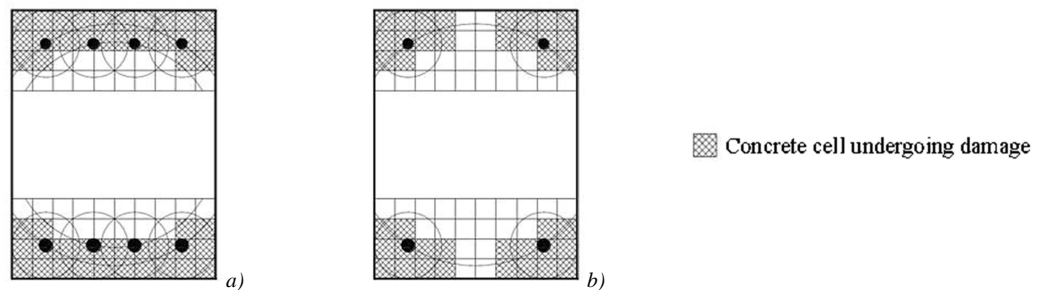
Concrete elements damaged by reinforcement corrosion, Biondini and Vergani[40]
